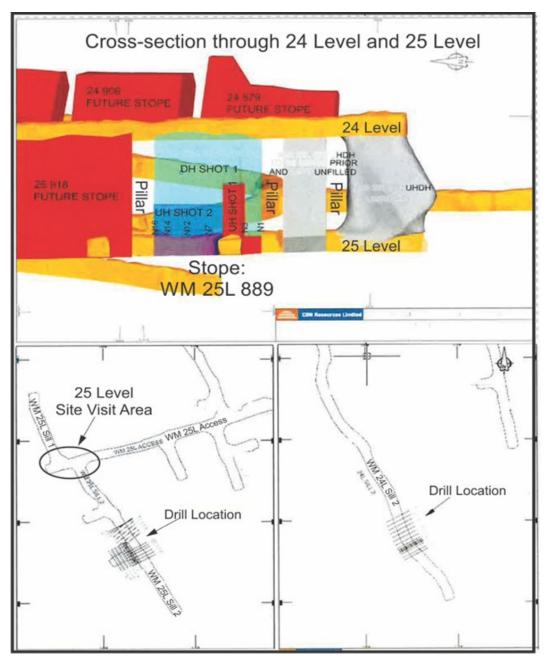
25 and 24 Levels, Rasp Mine—Cross-section and Plan View Source: ERM (modified after CBH Resources, 2024d)
